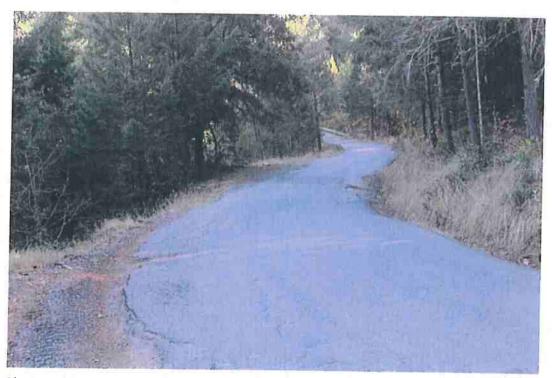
Mile 3.15: Dangerous pinch point at blind corner. 15-ft road width with 1-ft shoulders. Potential spot to widen corner on inside to improve width and visibility.
